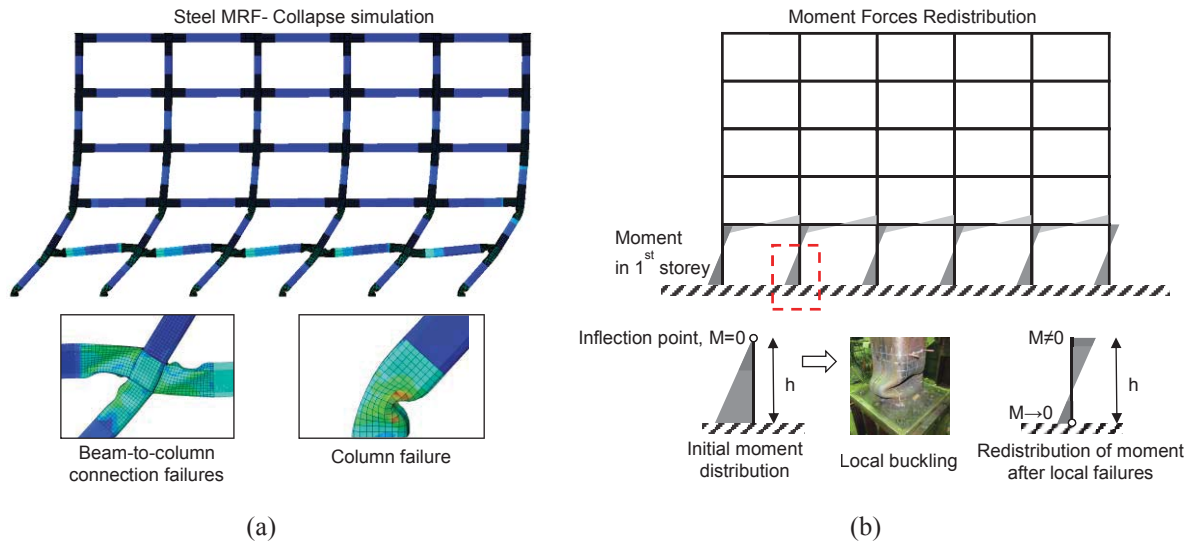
(a) Collapse simulation of a 5-storey 5-bay steel framed structure, local buckling failures in beams and columns [6]; (b) moment redistribution in columns at base after local buckling in beams and columns.
